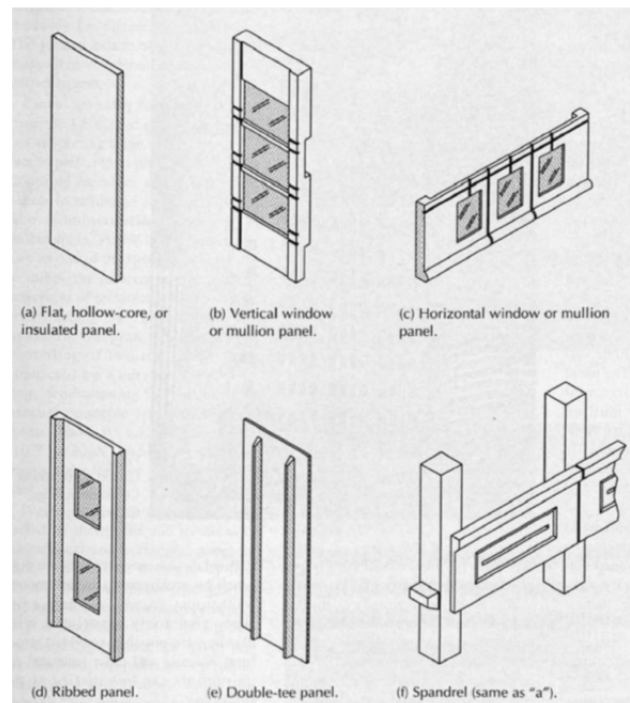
Several examples of Architectural load-carrying sandwich wall panels* (Freedman, 1999).
